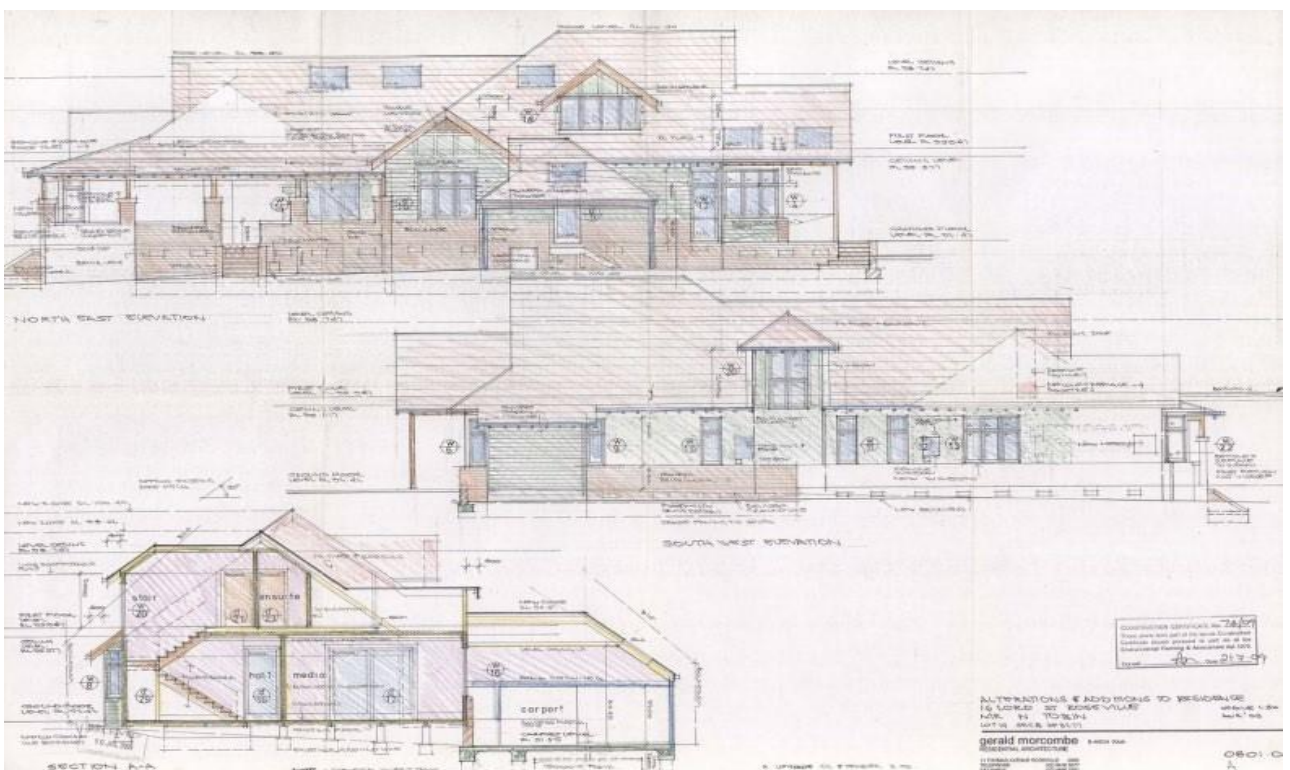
North-east elevation, south-west elevation and Section A-A dated from 2009
